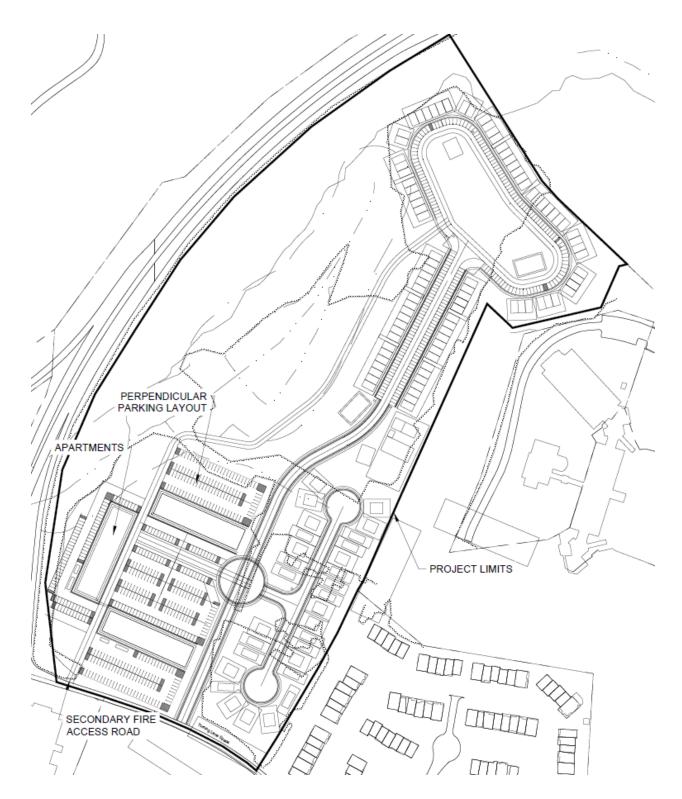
Preliminary Site Plan 95% (November 13, 2023)
